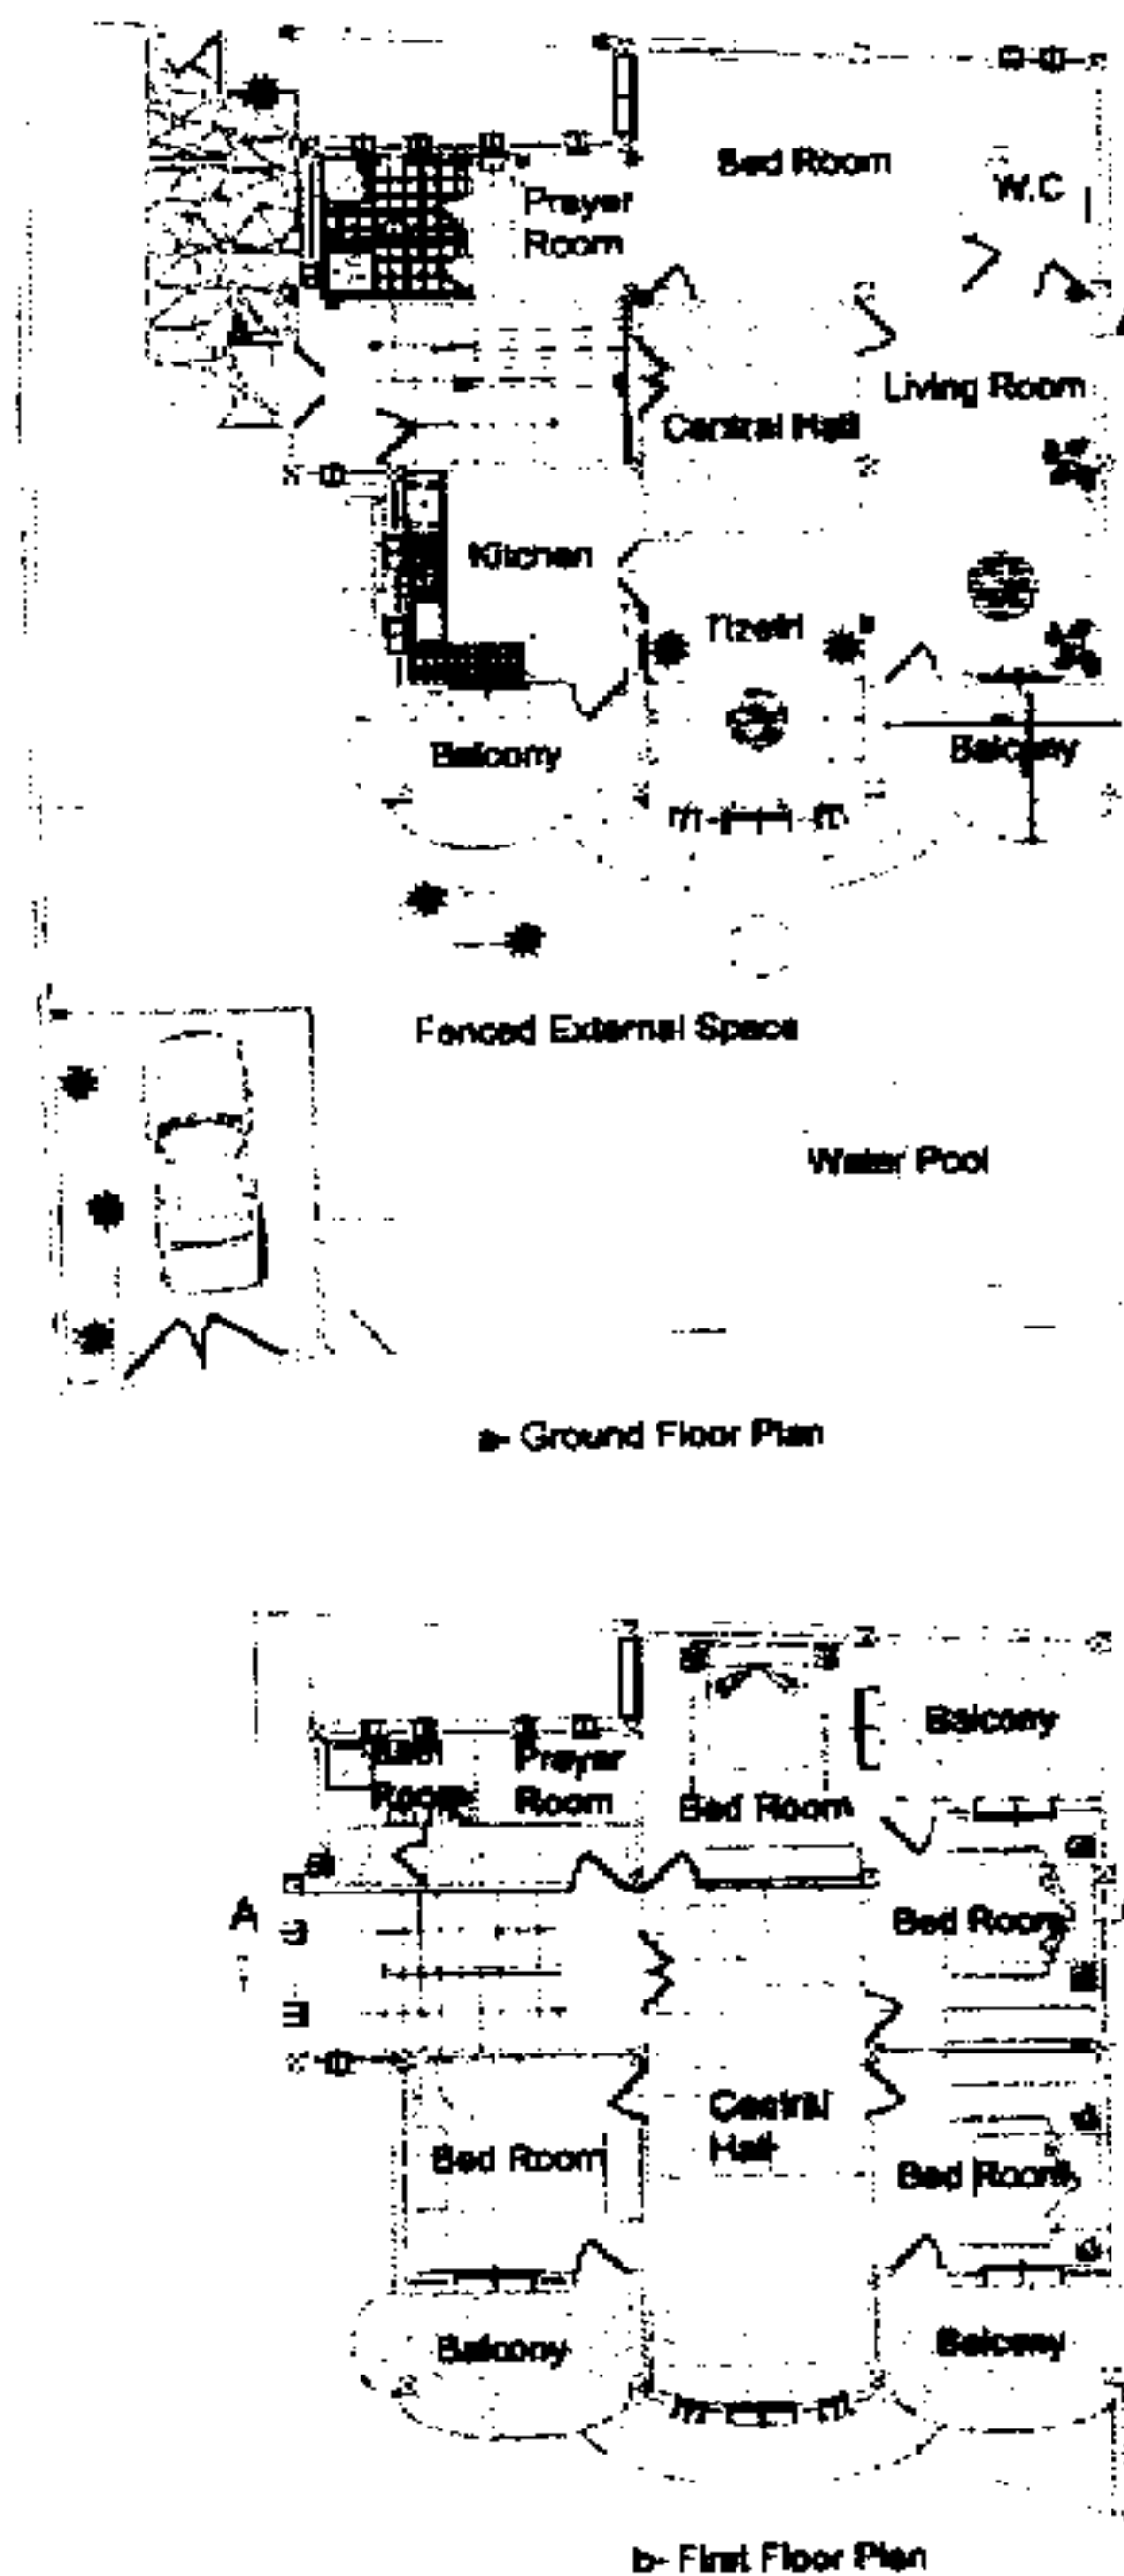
Typical plans produced by professionals (a: ground floor plan, b: first floor plan).
